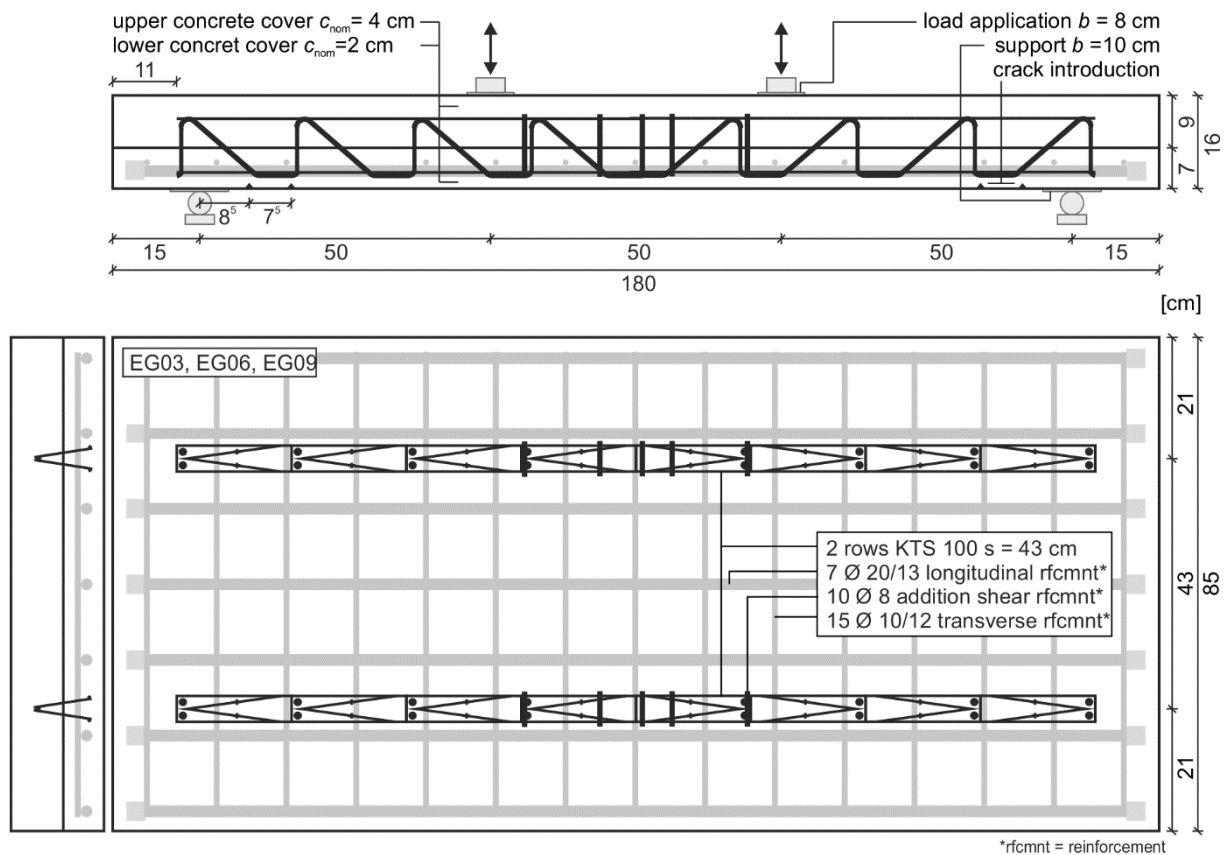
Reinforcement detail of specimens EG03, EG06 and EG09
